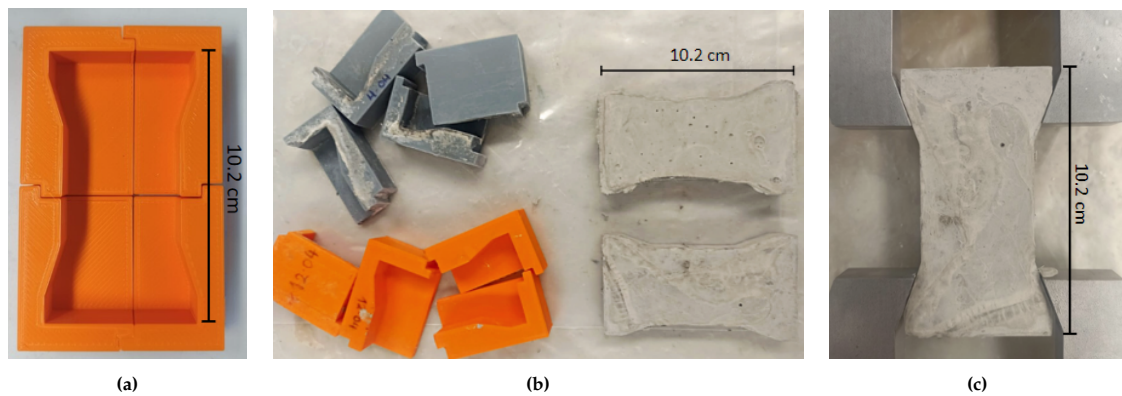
Fabrication of initial dogbones: (a) 3D printed mould (b) demoulding & (c) fitting in Instron setup
